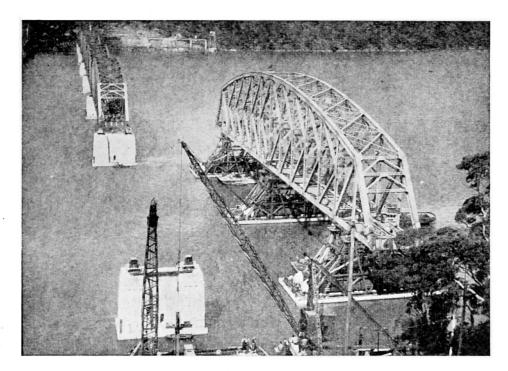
New Hawkesbury River Railway Bridge. Floating in 445-ft. span
